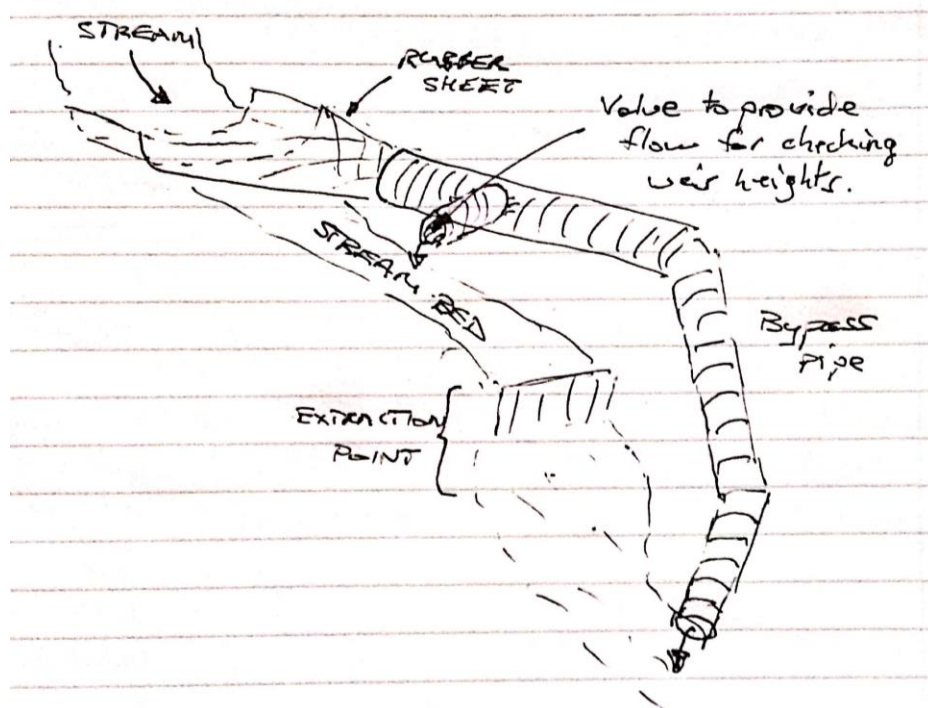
General arrangement of a temporary pipe to divert stream flow while building the two stream crossings. A similar arrangement working as a syphon between two pools will bypass the extraction point during construction.
